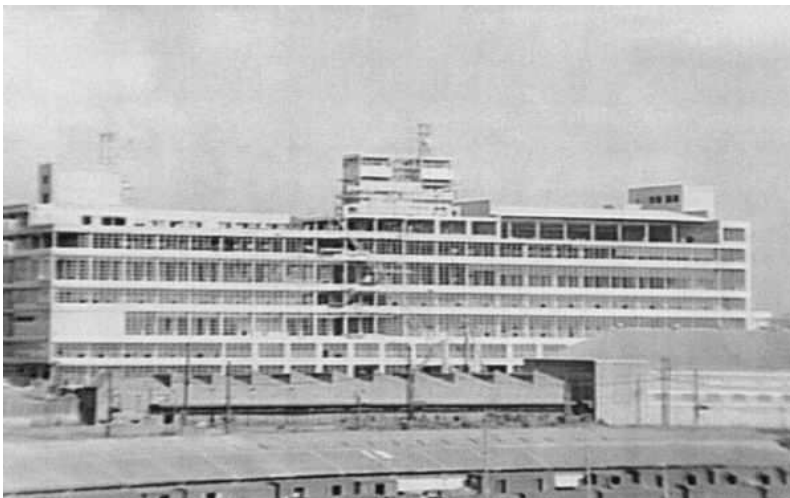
View to the west of the partially completed government Printing Office 1955-1960. the saw tooth roof sheds and the large brick building of the meat works are still present and further construction of rail sheds has been undertaken to the east of the site (ML GPO2-08771).
